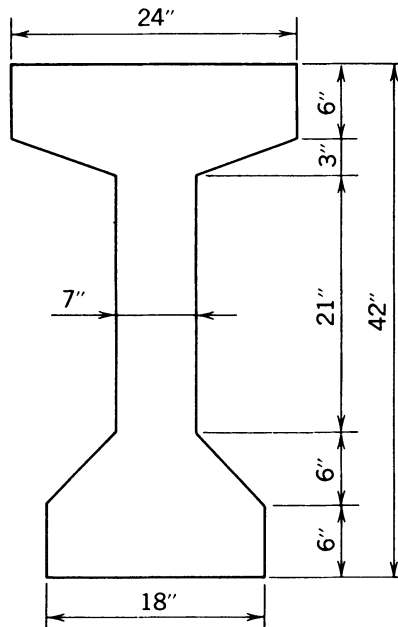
Beam cross section, revised, I.P. 9-11.
